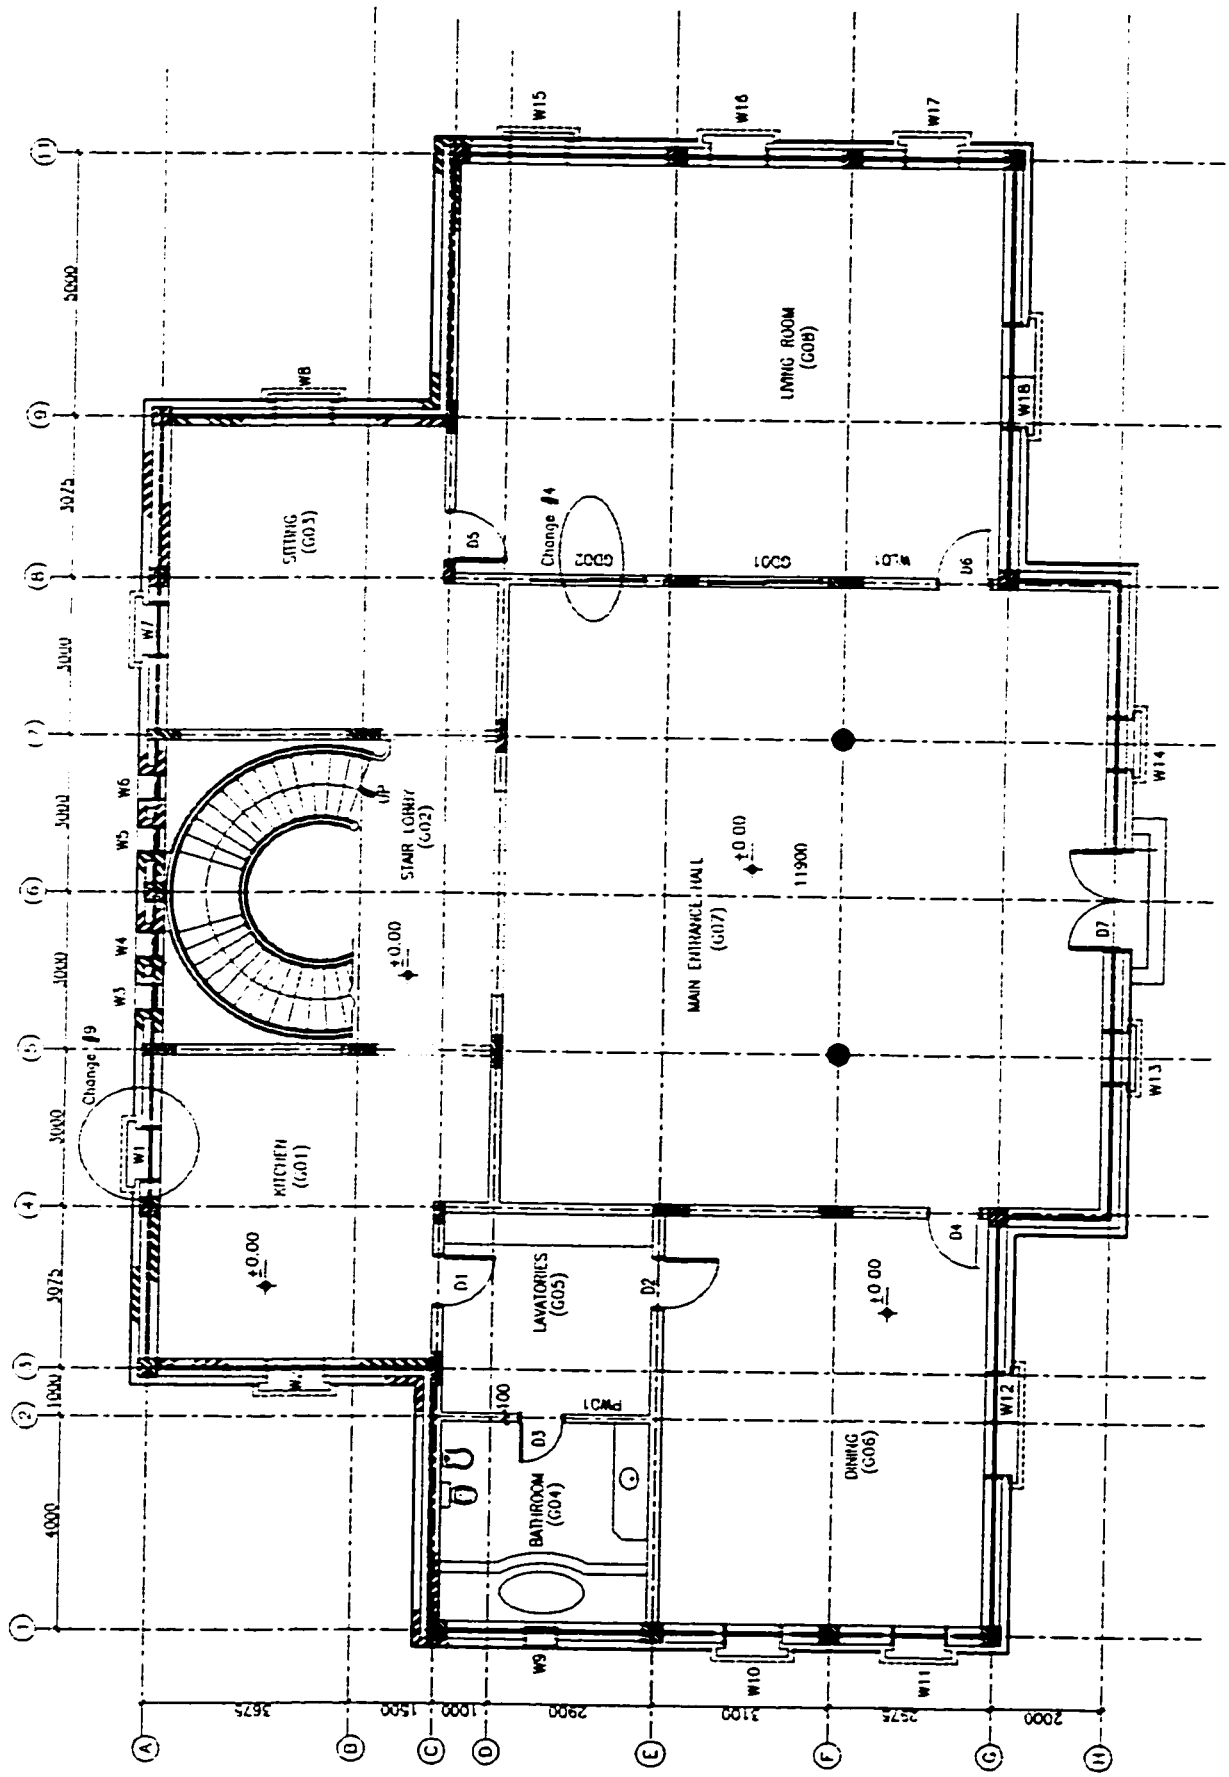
Ground Floor Architectural Plan of the Case Study Building.
